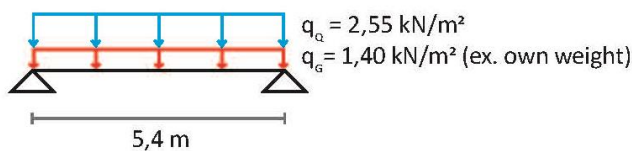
LOAD SCHEME INTEREMEDIATE FLOOR
